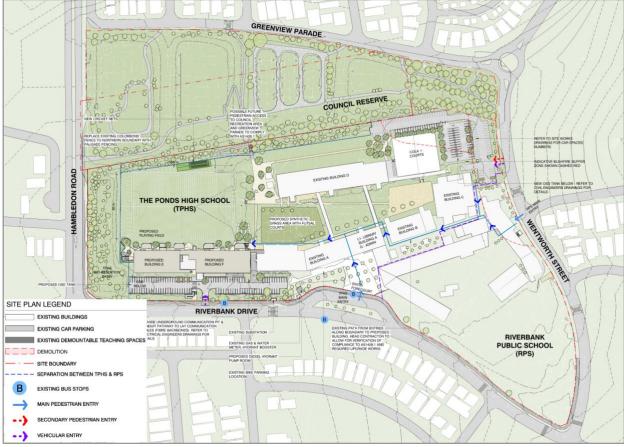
The Ponds High School (Proposed) - indicative only, subject to detailed design (Source: DJRD)
